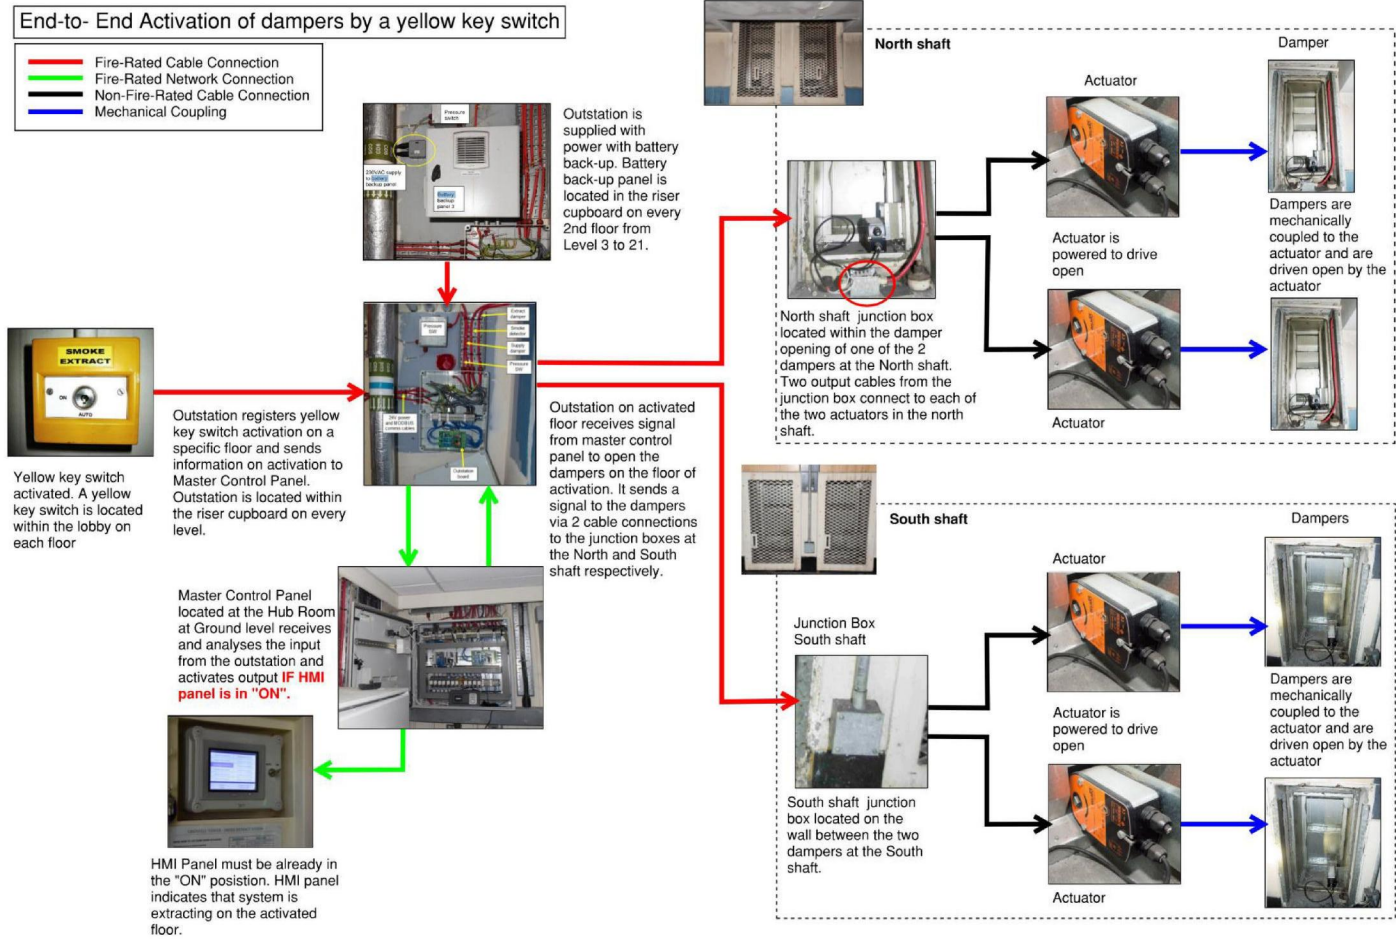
Activation of a fireman’s override switch on that floor (if the HMI were set to “ON”) which would cause the damper of that floor to open.
